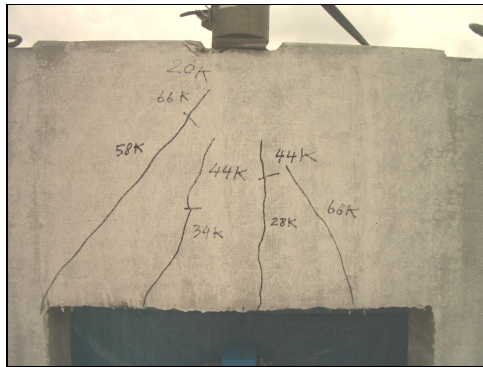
At 66 kips, crack at the corner of opening became larger and new crack occur at the right hand side of wall
